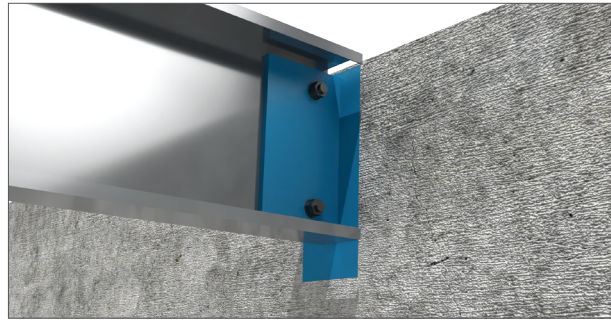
Detail of the longitudinal trimmer connection to a concrete element by means of an angle piece welded to a steel plate located in the concrete element
